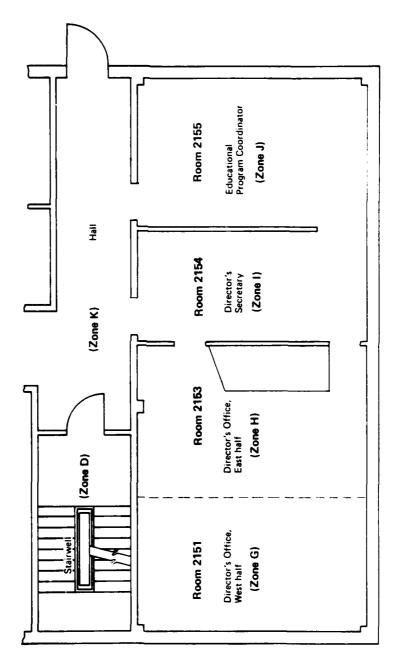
Plan of AFRRI's second floor, showing location of office spaces and zones used in initial survey
